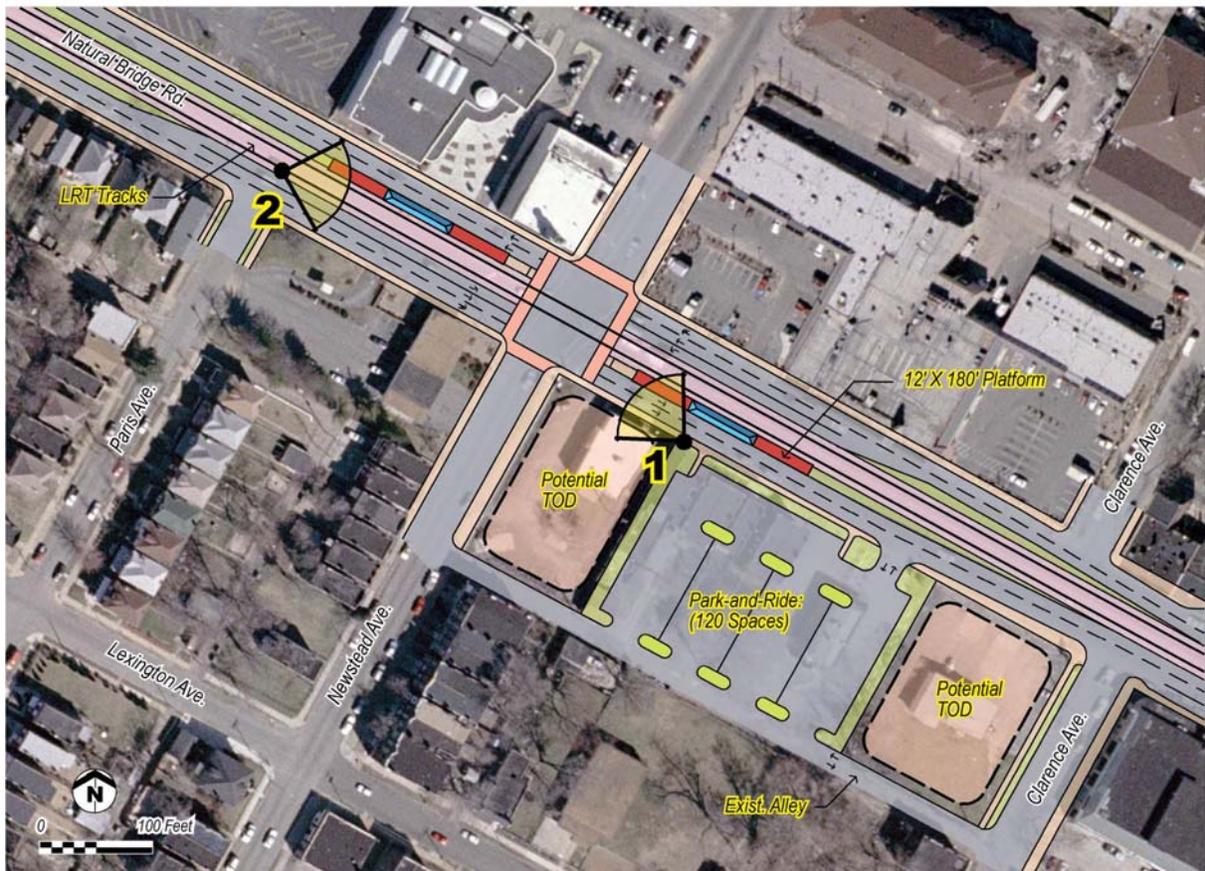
NATURAL BRIDGE AT NEWSTEAD STATION - PLAN
